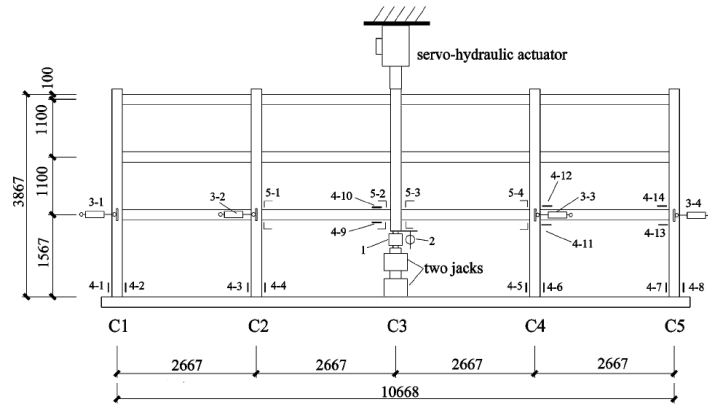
Specimen dimensions and the test set-up (Yi et al. 2008)
